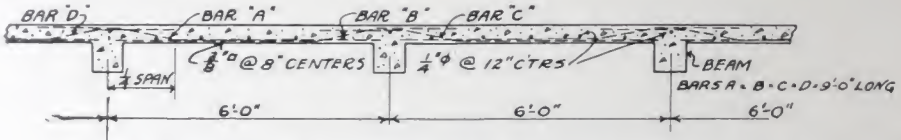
Section through beams and slabs showing typical bar design for slabs.
